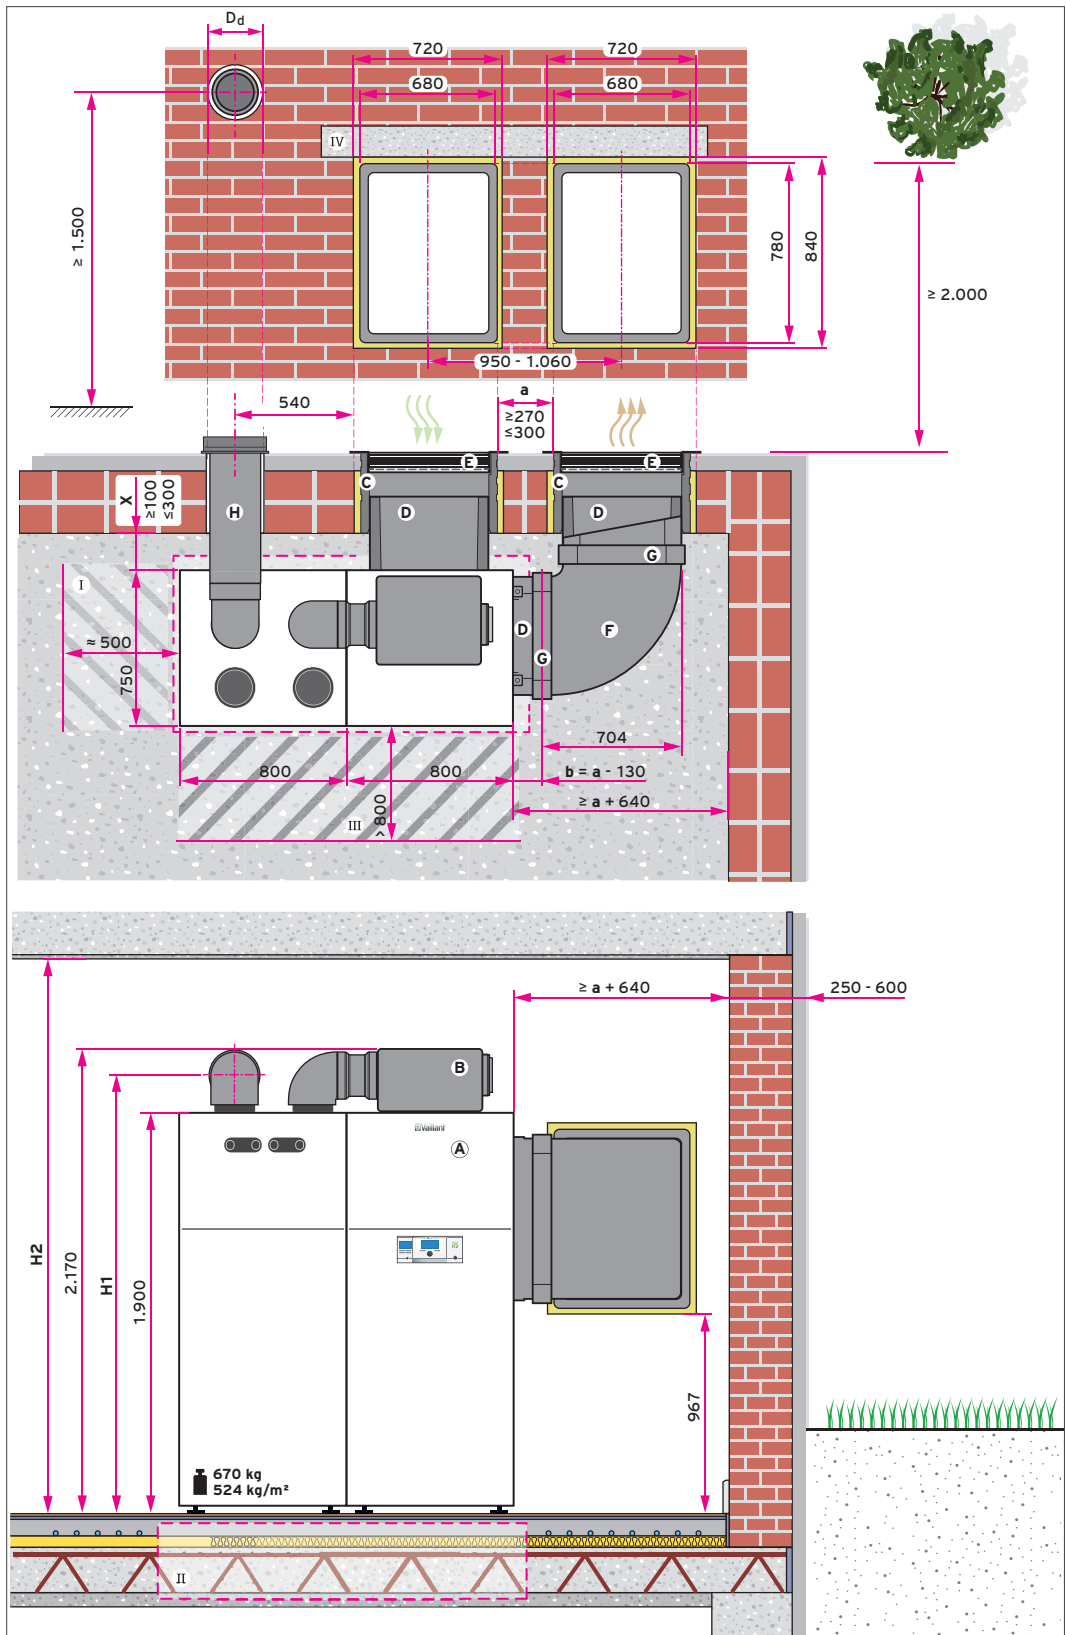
recoCOMPACT installation situation, ground floor - air intake at the rear, right-hand installation
